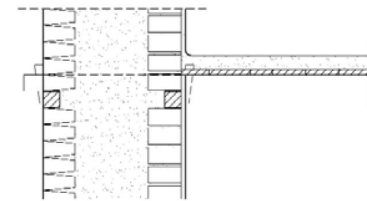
Connection between floor and wall in wooden Newar building (Bonpace & Sestini, 2003, p. 66)
